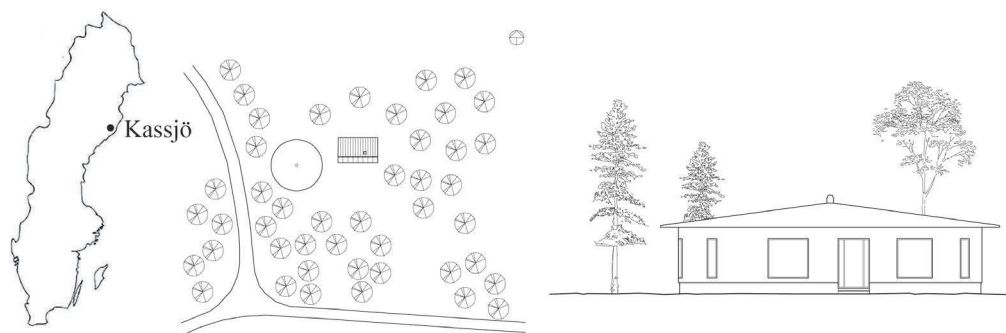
The Rundbalshuset. Site plan with the dwelling and guest house. South elevation with main entrance. Drawings are based on (Elva Hållbara, 2025) (Eybye & Dabaieh, 2025).
